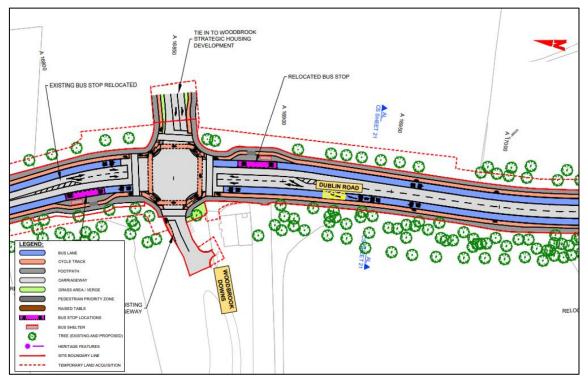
Extract from General Arrangement Drawings at Dublin Road (Sheet 48)
